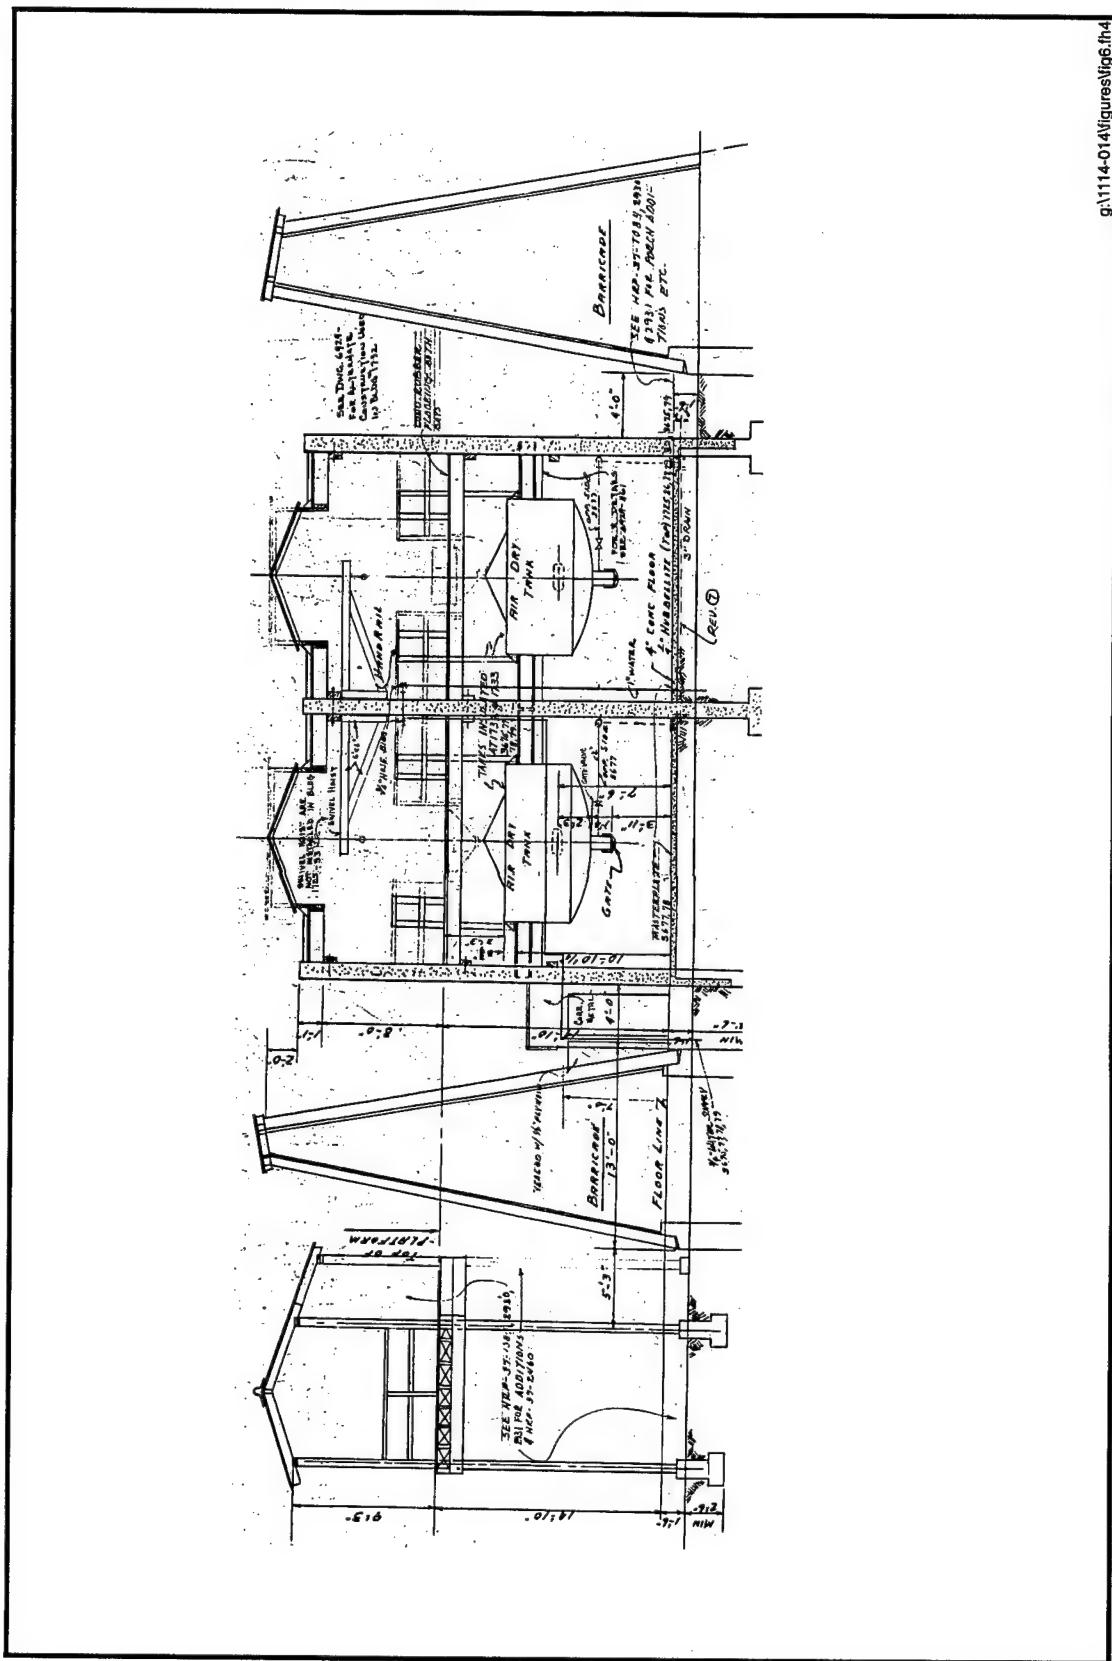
Interior elevation of Building 1725, the Open Tank Air Dry House, where solvent was removed using warm air (1940 HPC Drawing #6929-834).
